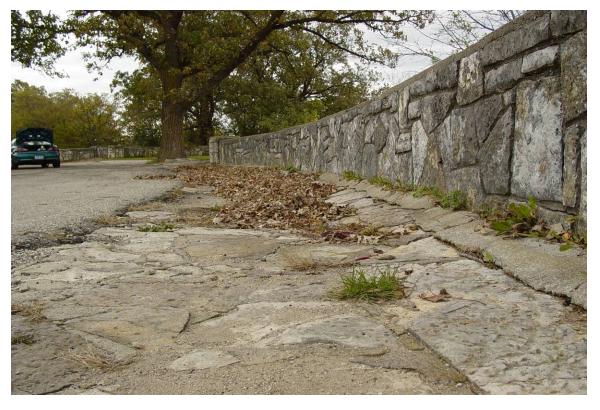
Subsidence of flagstone terrace adjacent to central portion of overlook wall, facing east
